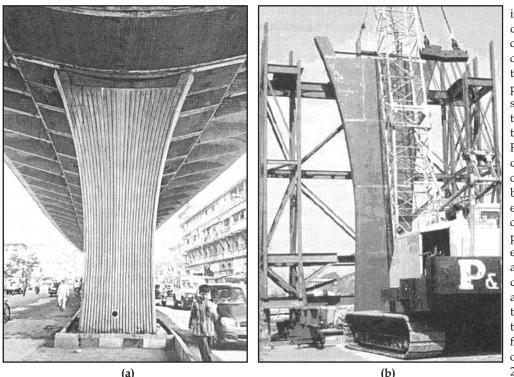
JJ flyover (a) Aesthetically elegant pier (b) Precast pier
